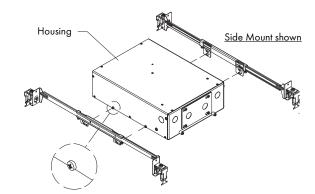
Attach T-Grid Clip assemblies to Hanger Bracket Assemblies
